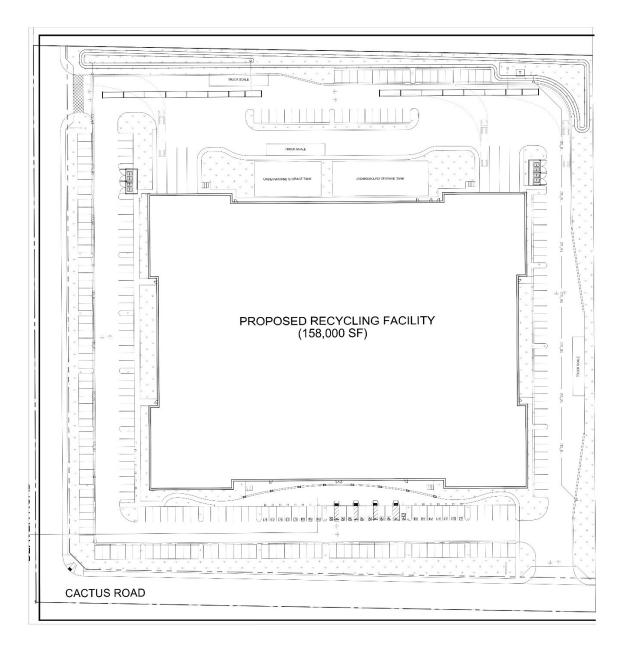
PROPOSED SITE PLAN SOURCE: Blue Engineering
